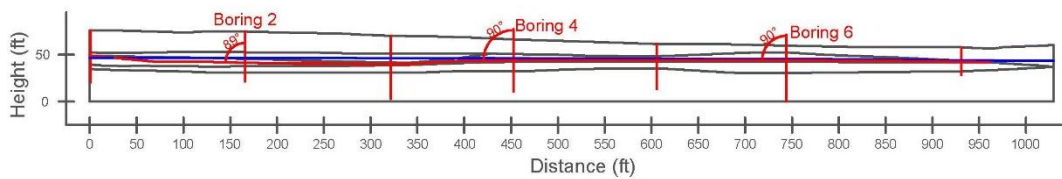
Sub-sectioning of the cross-section and failure plane for San Fernando Valley Juvenile Hall
